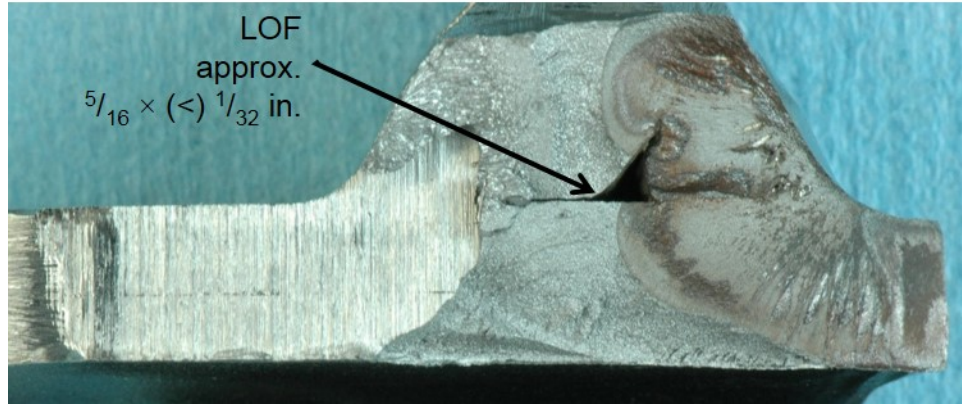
Fracture surface photographed perpendicular to the camera to clarify the LOF — crack to the south of rib in MU3 at 35 degrees from the rib soffit
